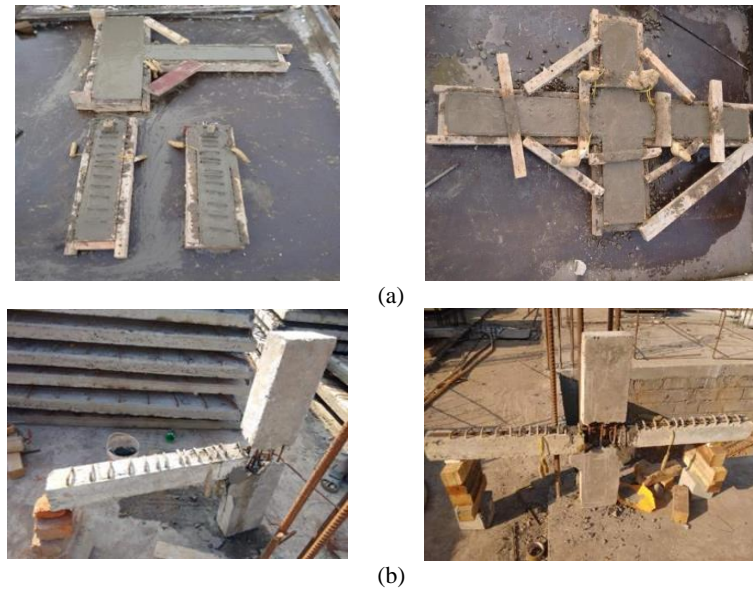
Casting of interior and exterior joint specimens, (a) Monolithic beam-column connection (MBC-EJ and MBC-IJ), (b) Emulative precast beam-column connection (EBC-EJ and EBC-IJ).
